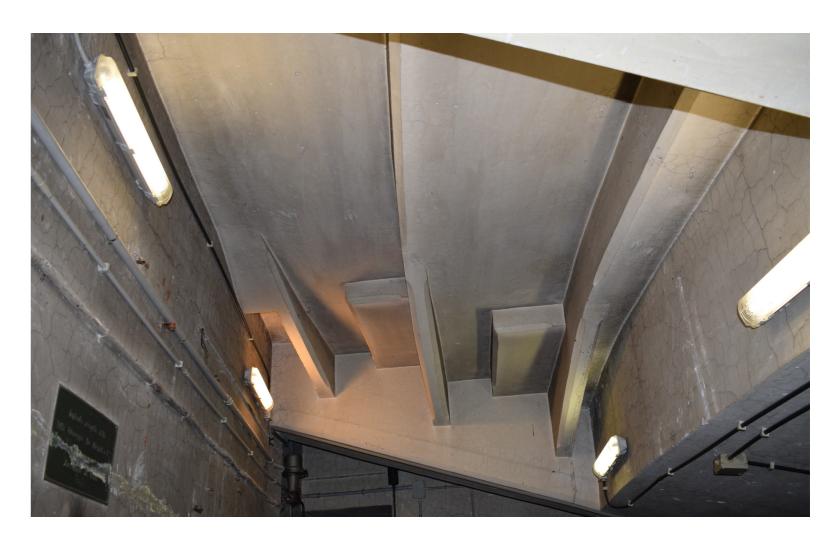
View of the concrete structure from the installation room at the foot of the Tower of classrooms (© Cortesi 2020)
